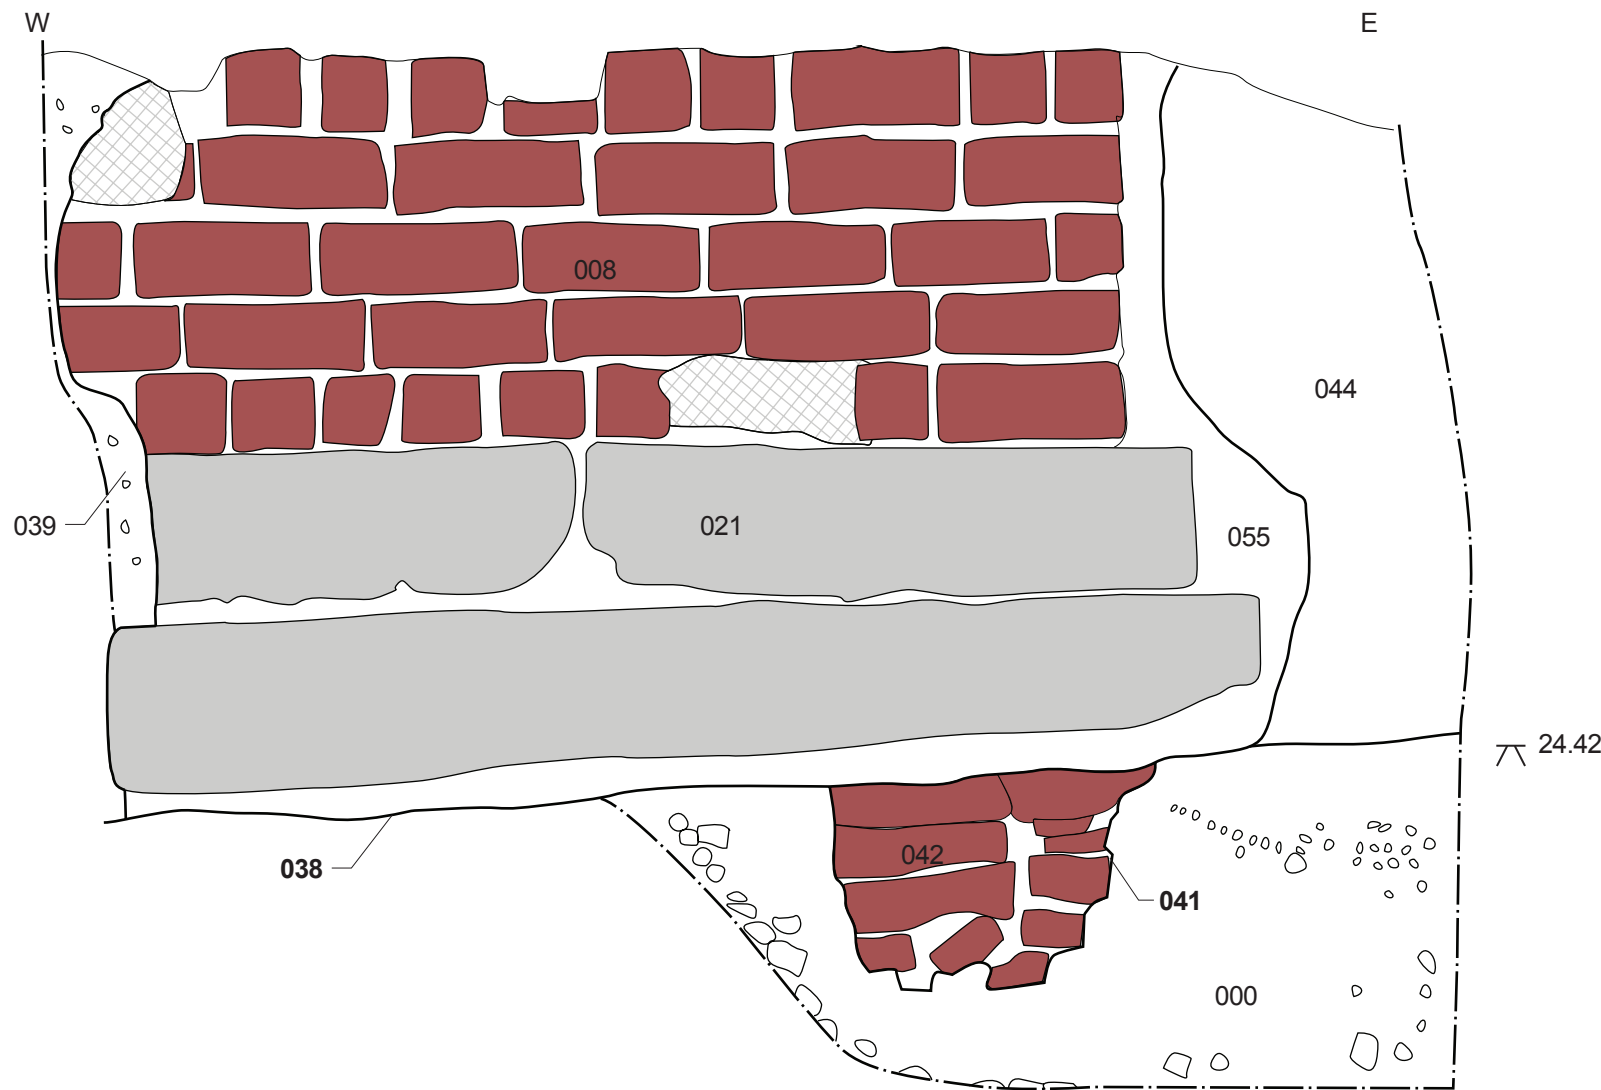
South-facing section of chimney base 008/021 and surrounding deposits
